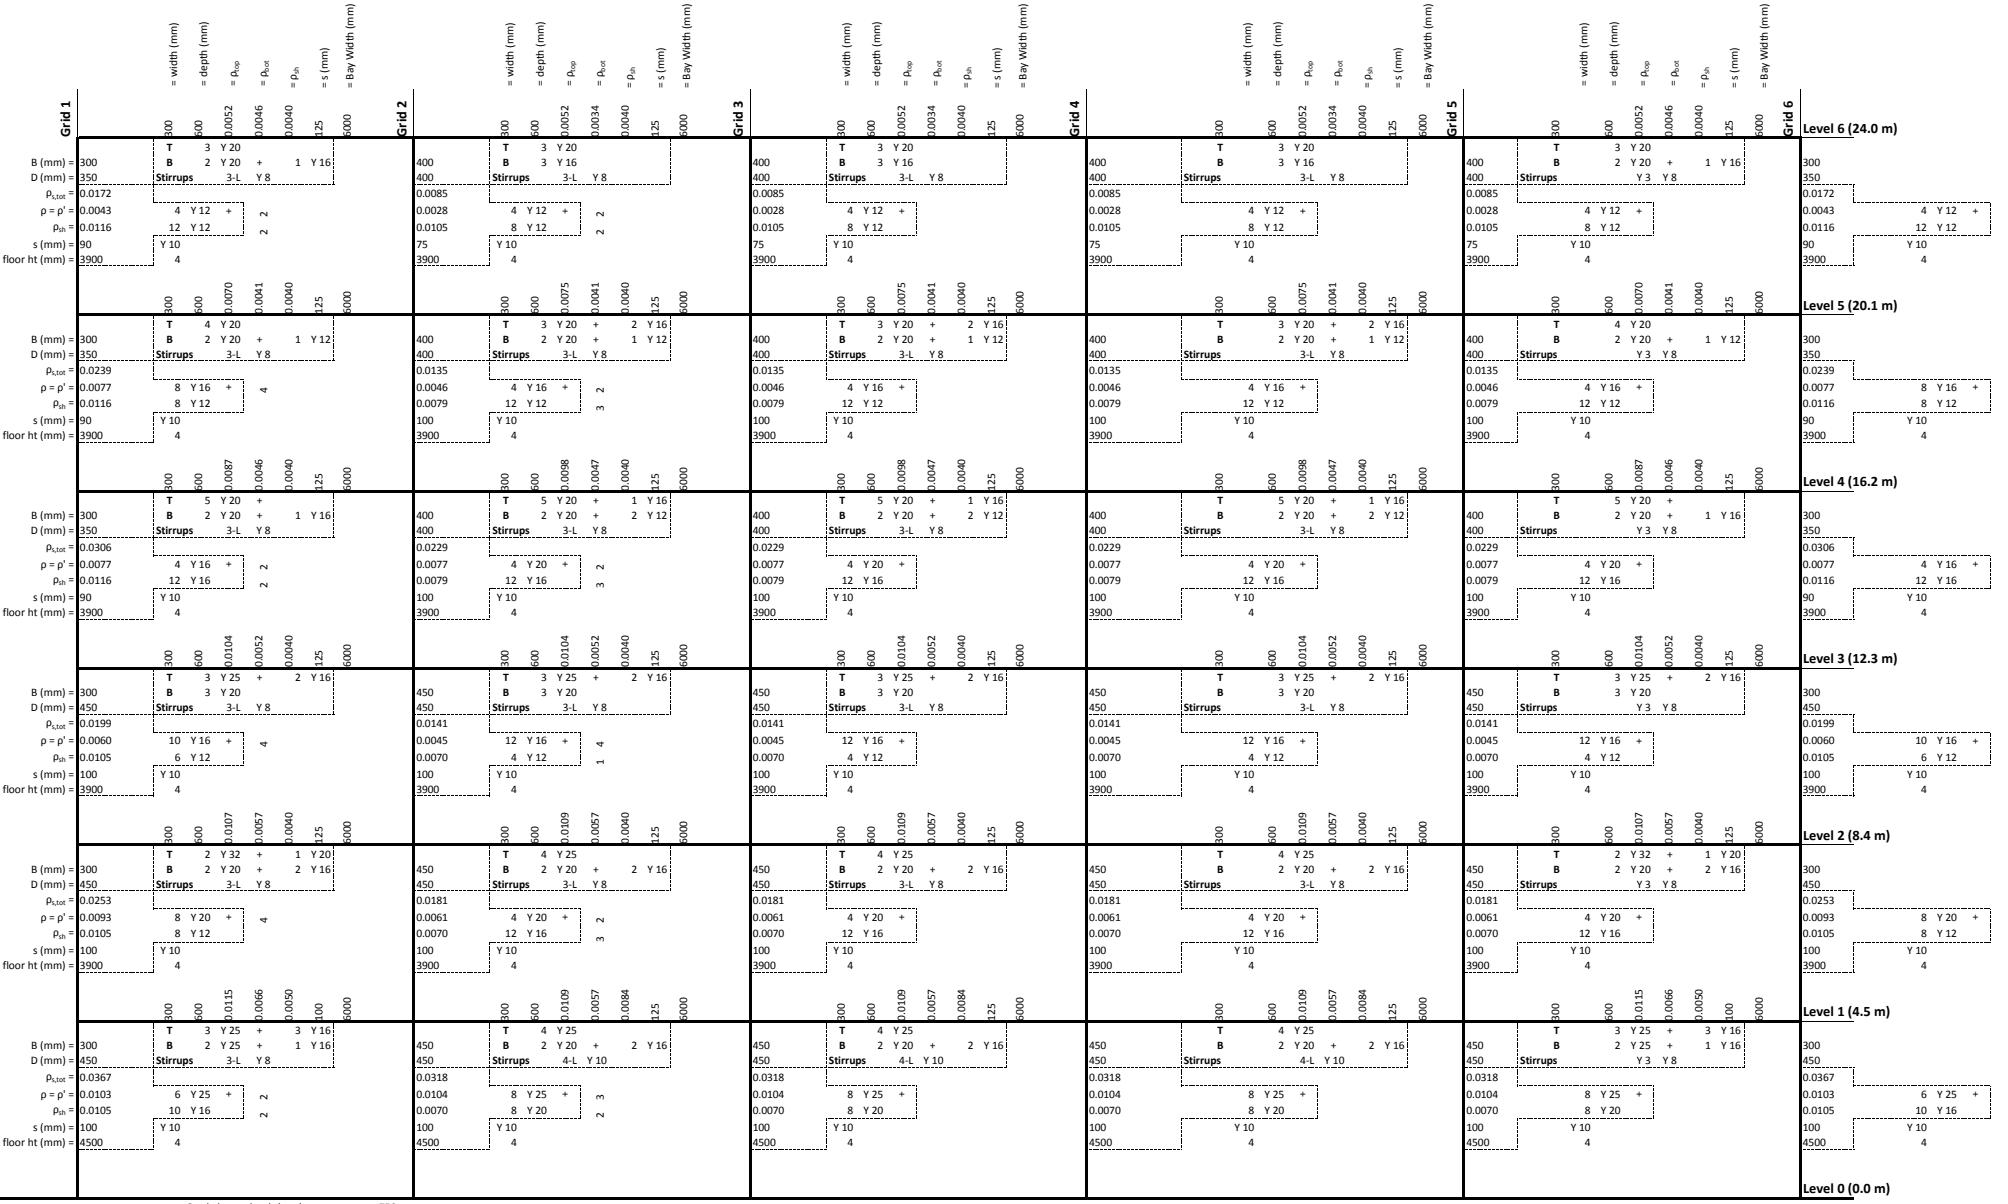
Provided reinforcement and modeling details for building ID 2447
